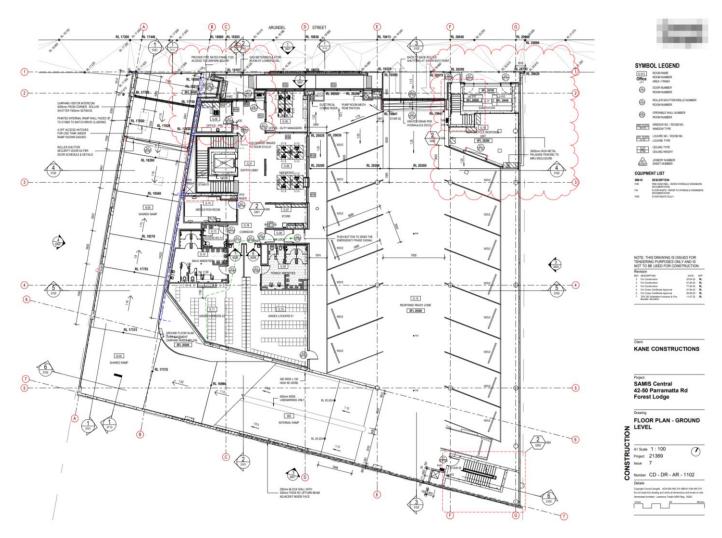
Proposed Ground Level Plan (Conrad Gargett)
